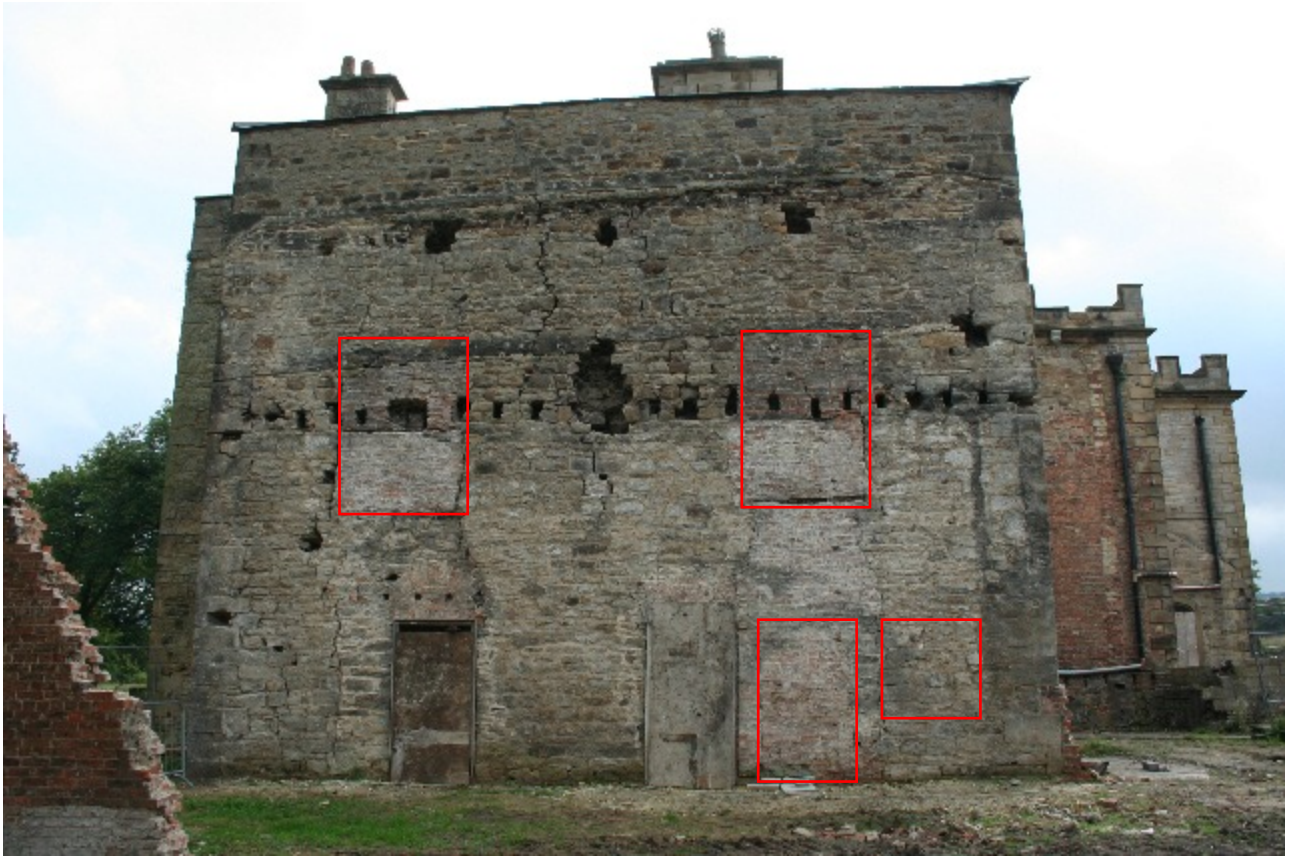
The western elevation, showing blocked openings in red (frame HHR13425).
